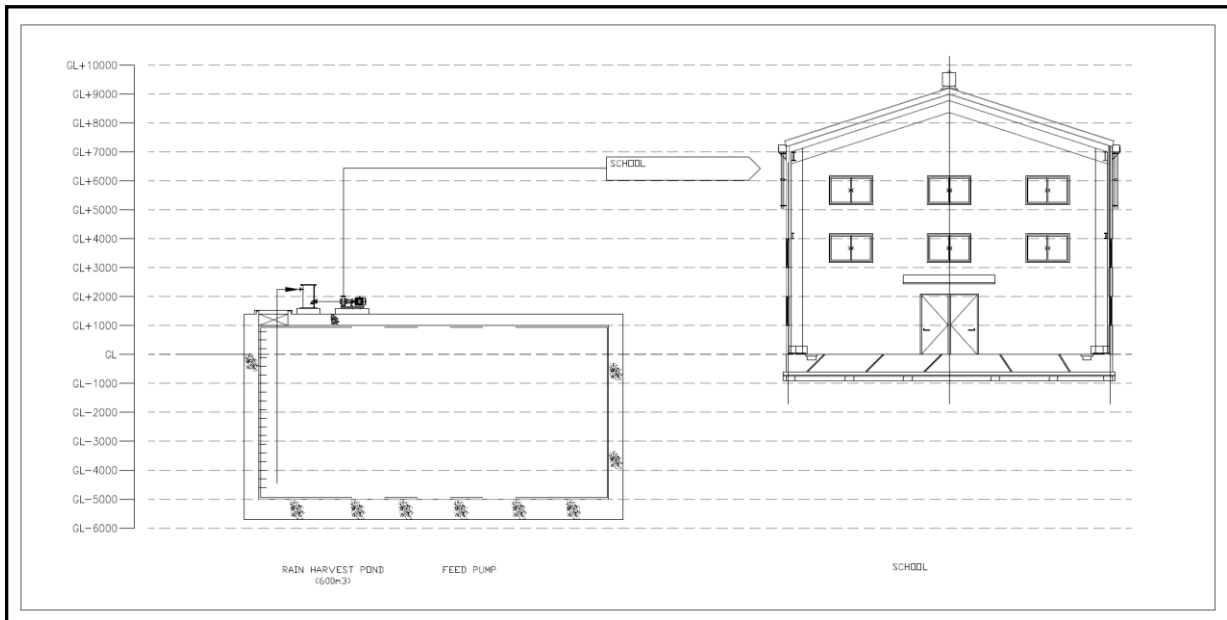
Typical section drawings of Proposed Rainwater harvesting system
